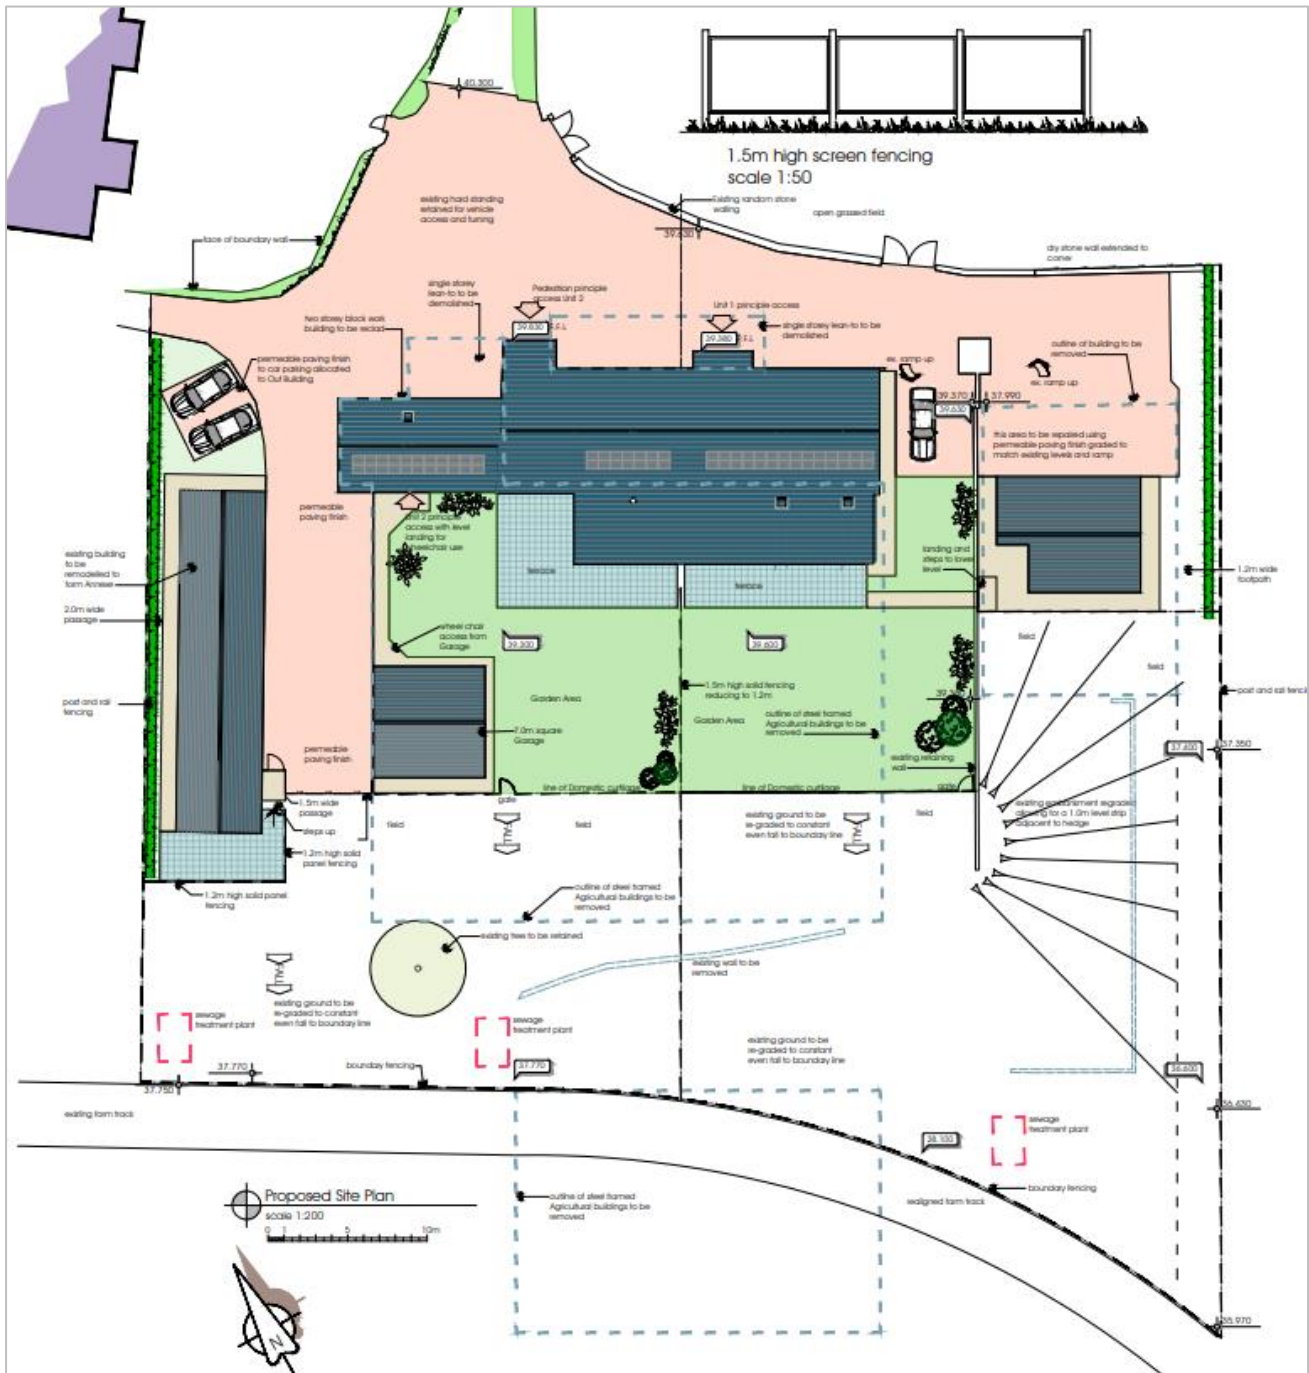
Proposed site plan – showing buildings to be demolished (dotted), converted outbuilding to the west and new garage structures to the south and east.
